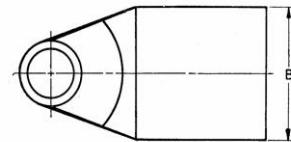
DRAFT TUBE DESIGN TYPE I (FOR HEADS UP TO 200-250 m)
